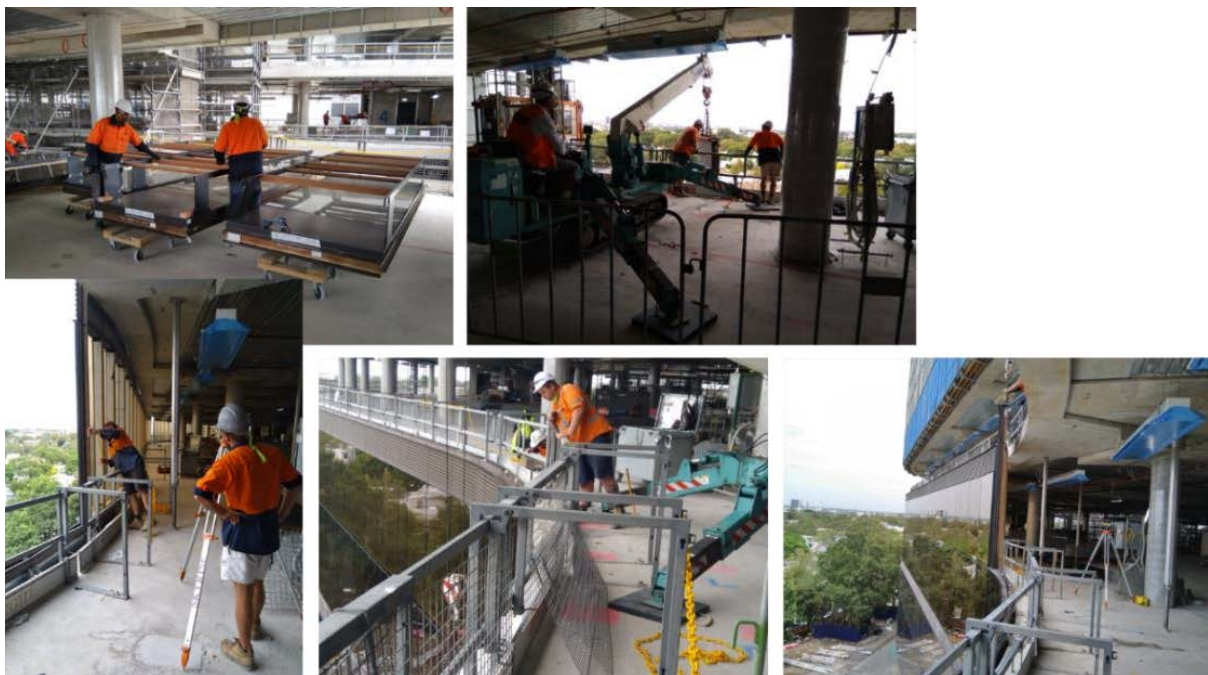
Pictures of the curtain wall façade crew (Case ATROUS)
